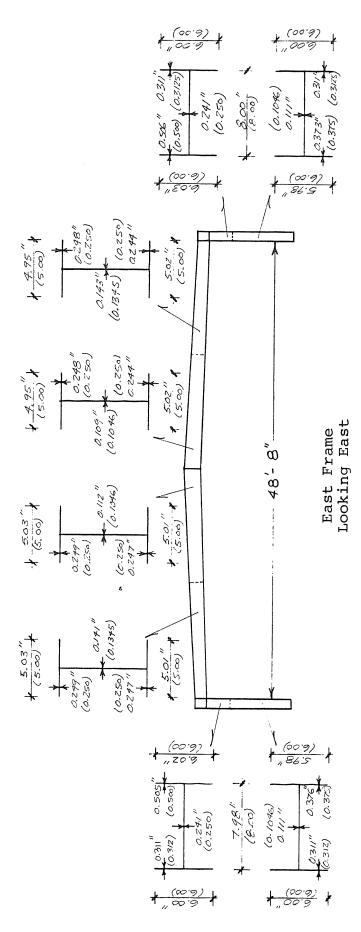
Details and Dimensions of Test Specimens -- Frame 6
